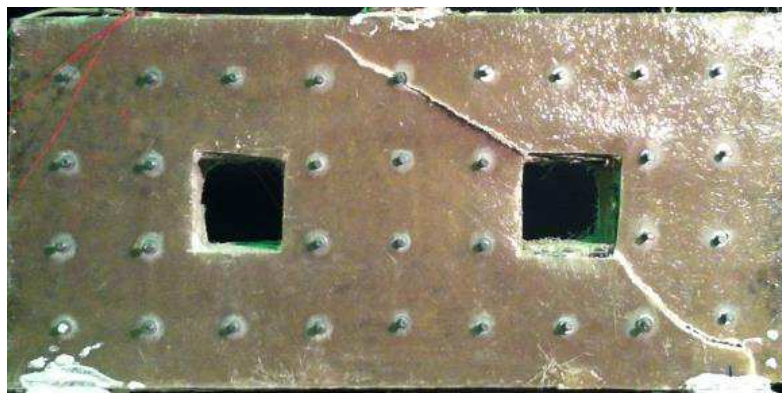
Typical failure mode of SFRP strengthened beam specimen of group B
